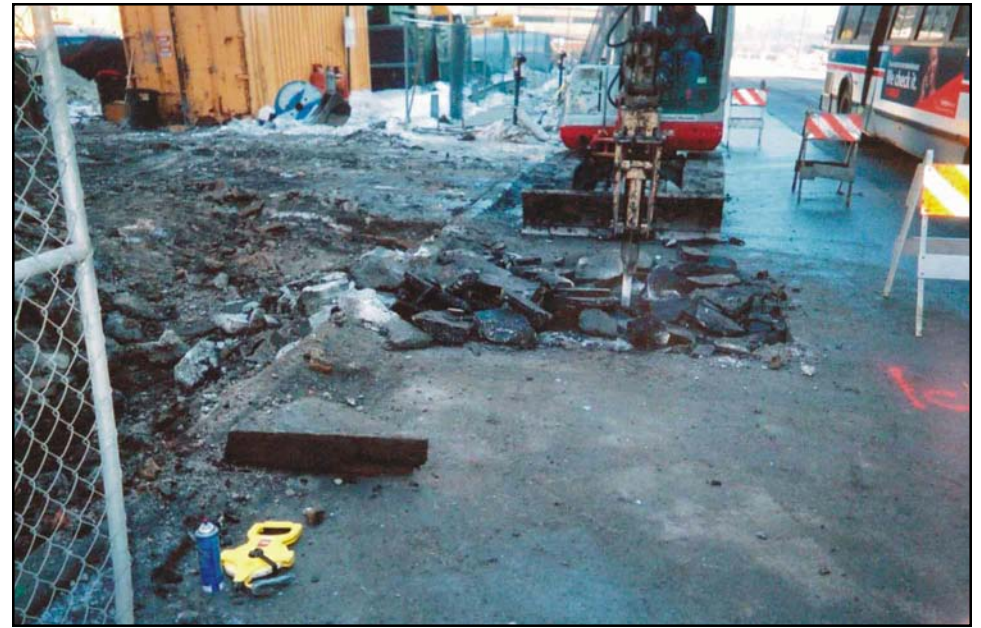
Breakup pavement in proposed sewer trench in Grand Street. 02/03/05
